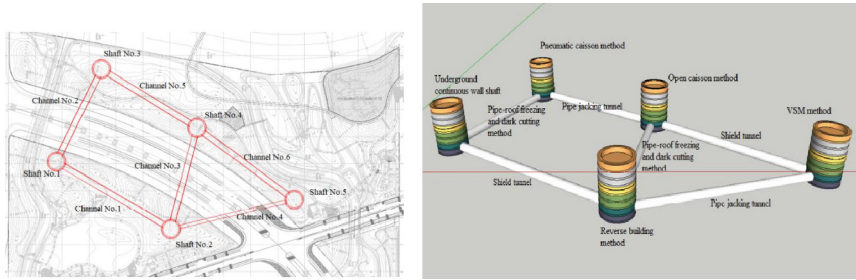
Plane layout planning of wedge-shaped greenfield deep underground test base
